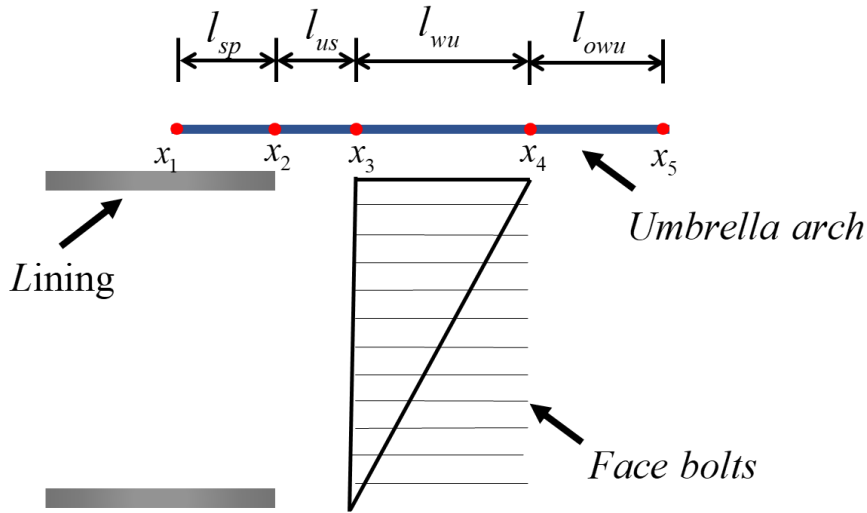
Excavation face after pre-reinforcement of pipe roof and horizontal bolt
